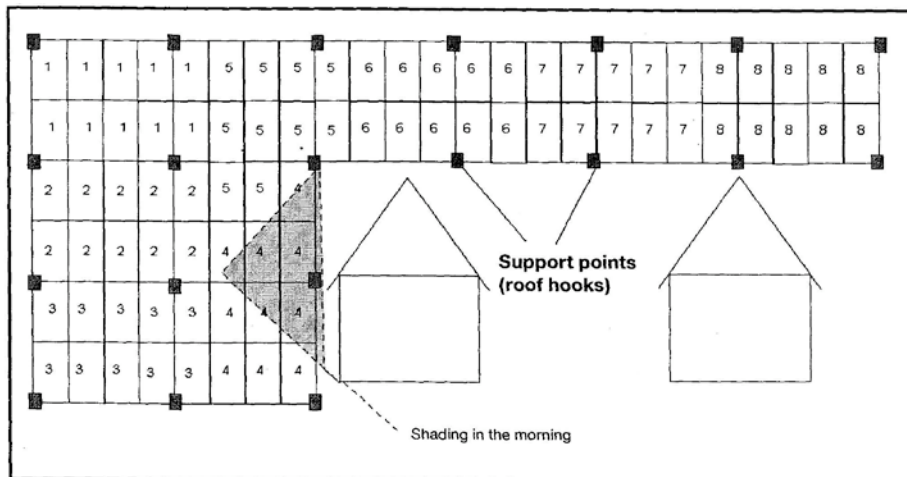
Module arrangement plan with roof hooks. Source: solar power laboratory, Christiani
